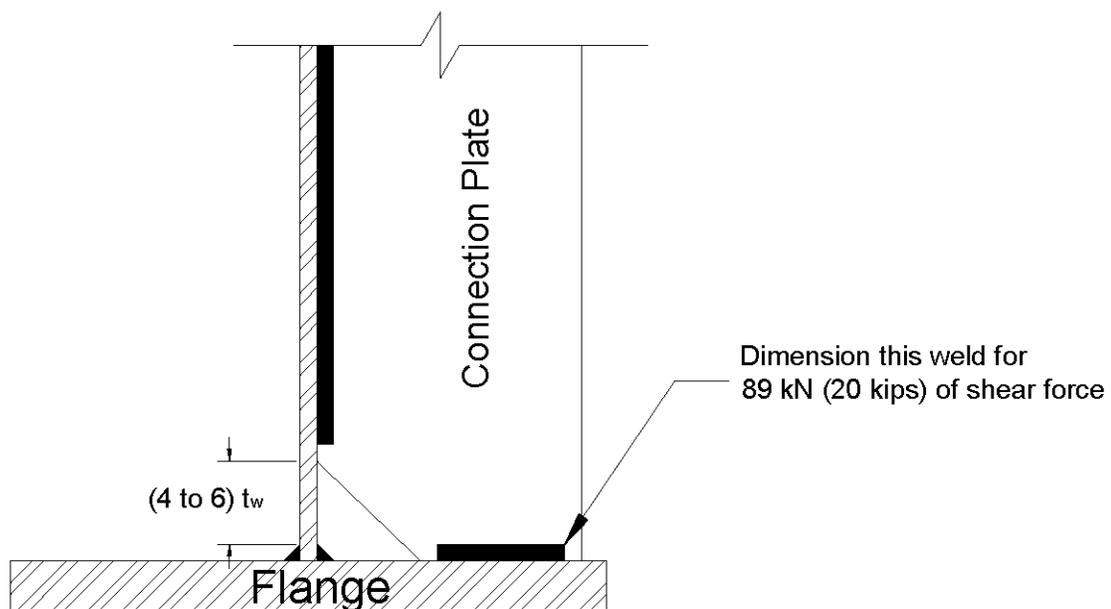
Connection plate-to-girder fillet weld detailing. (Keating 2001)
